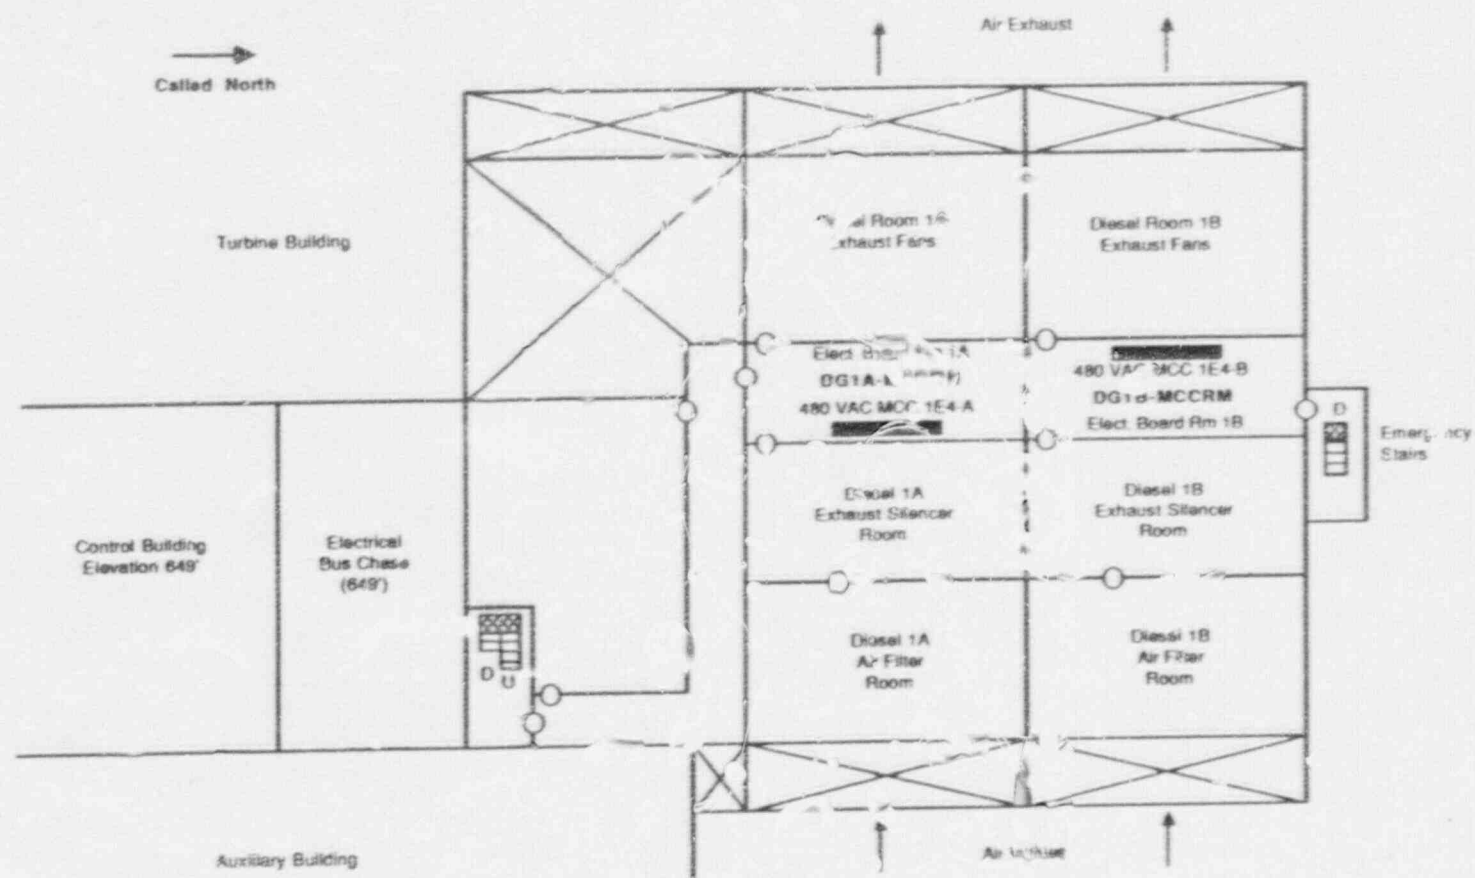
Bellefonte Diesel Generator Building, Elevation 655'0"
